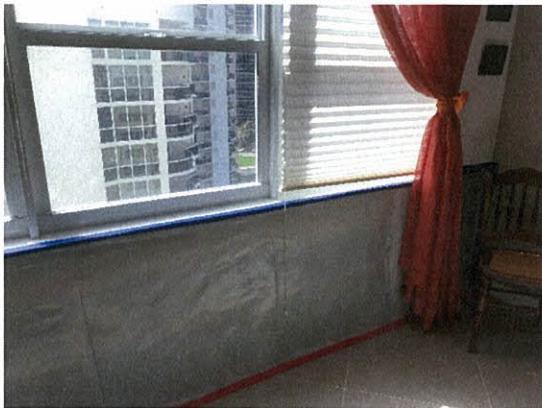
Removed wall section below window sill due to water damage from moisture infiltration.
